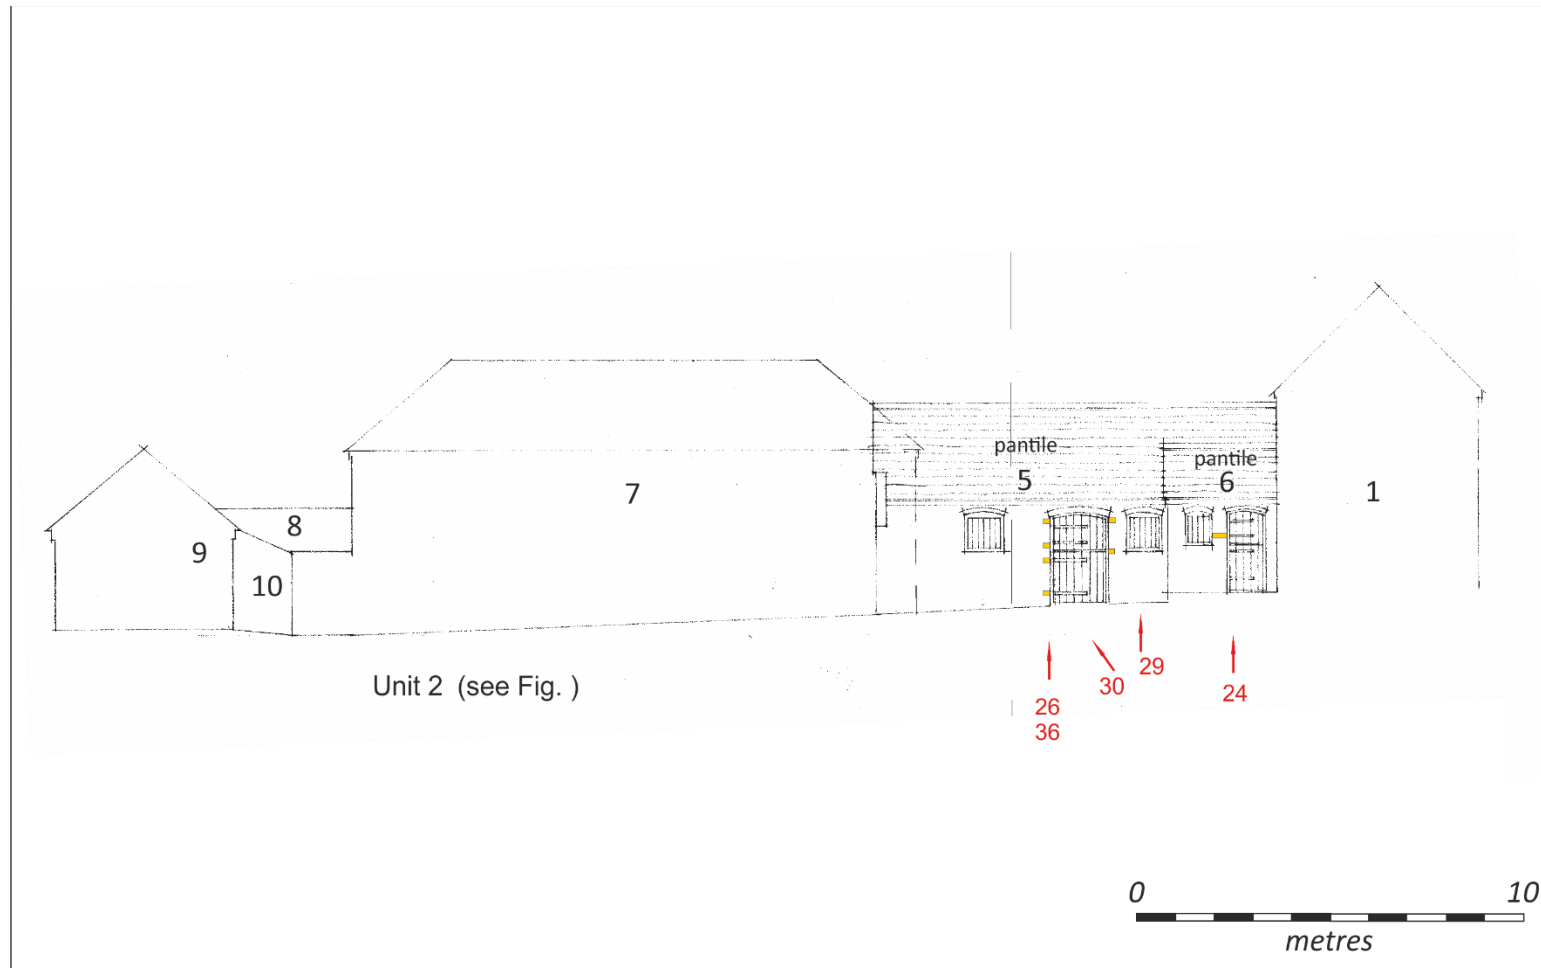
Unit 1 South-west elevation. Numbered arrows show direction of photographs. See Appendix 1
